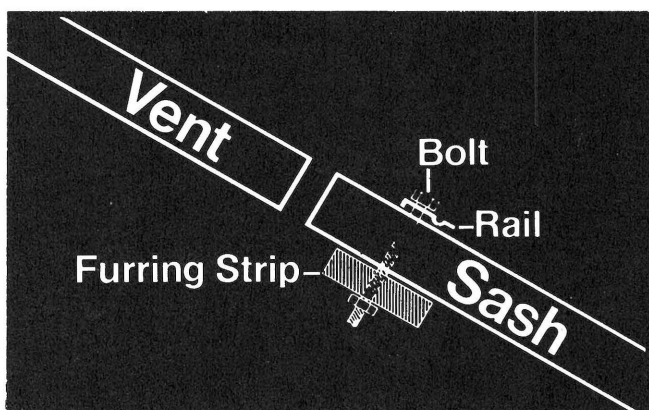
A.5. To secure poly fasteners to sash bars at areas without cross beams, reinforce with a one-by-three furring strip as shown. Monsanto Plastics & Resins Co. photo
